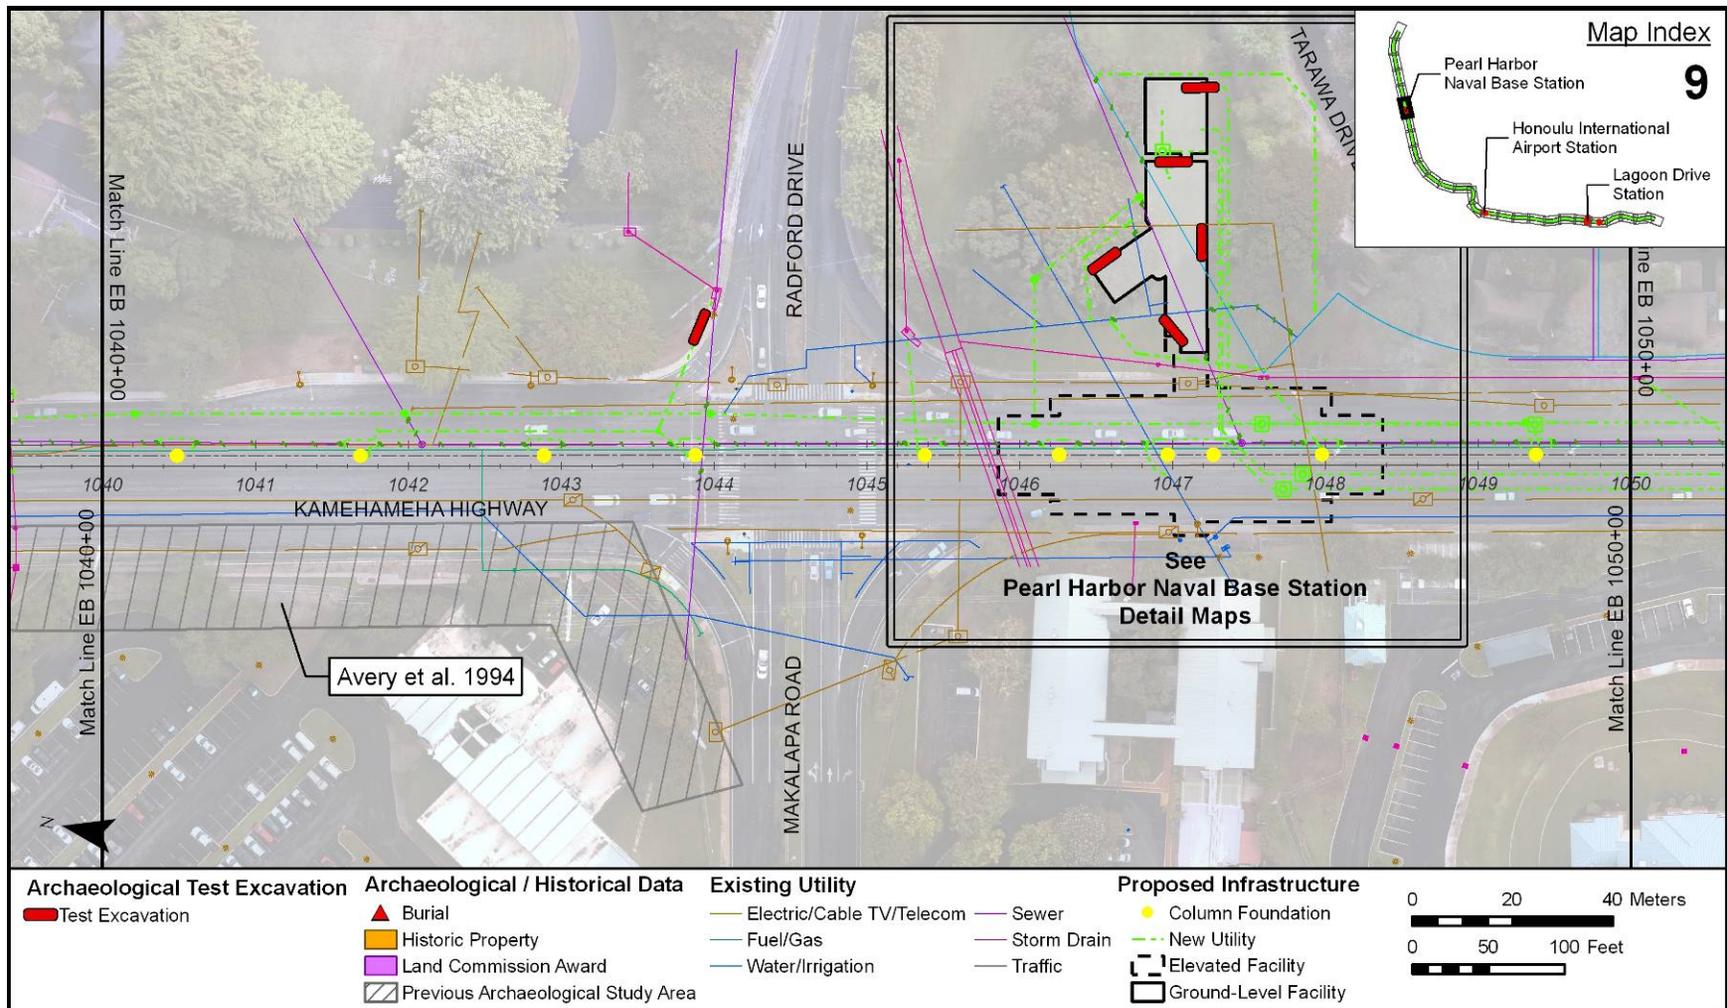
Map Sheet J 9 (near Radford Drive), one 20x2 excavation at utility relocation (24" storm drain) @ 1043+90 (see Station testing layout on following figure)
